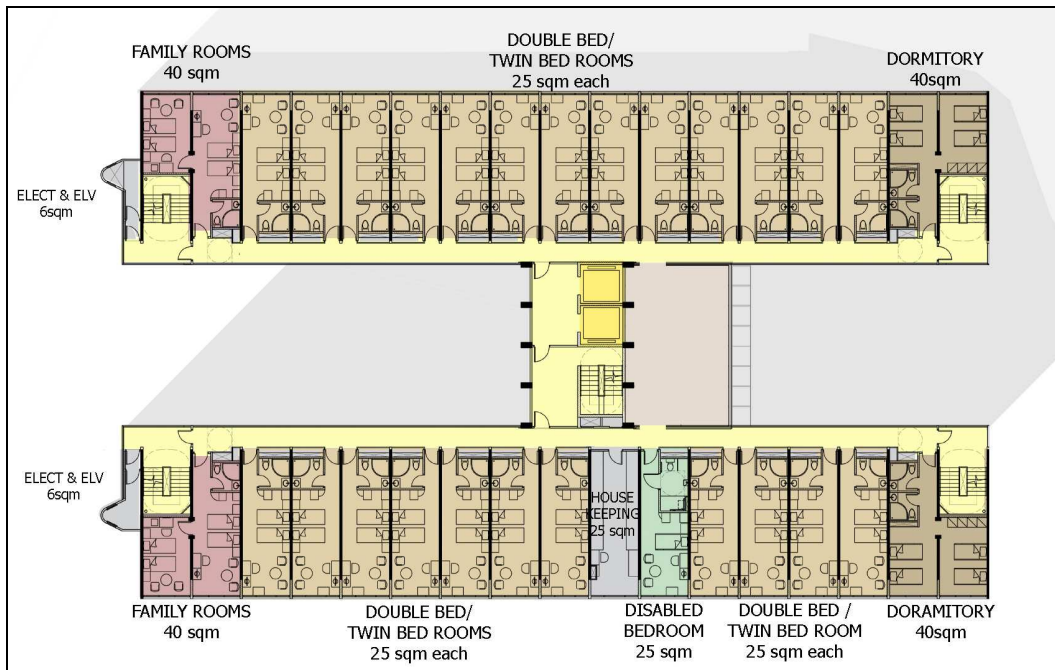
First floor plan – proposed layout for adaptive re-use scheme
